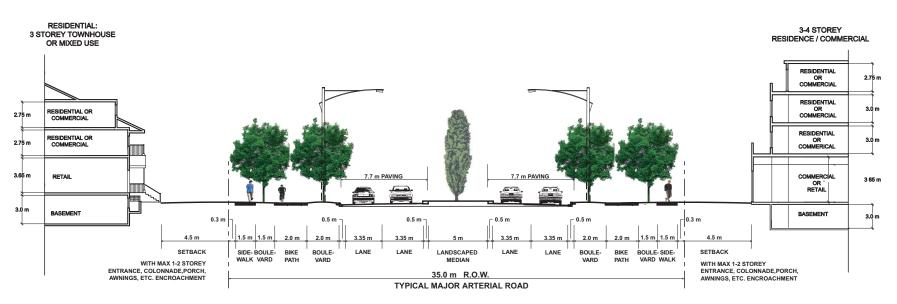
Major Arterial Road should be lined by buildings placed close to the street edge.
